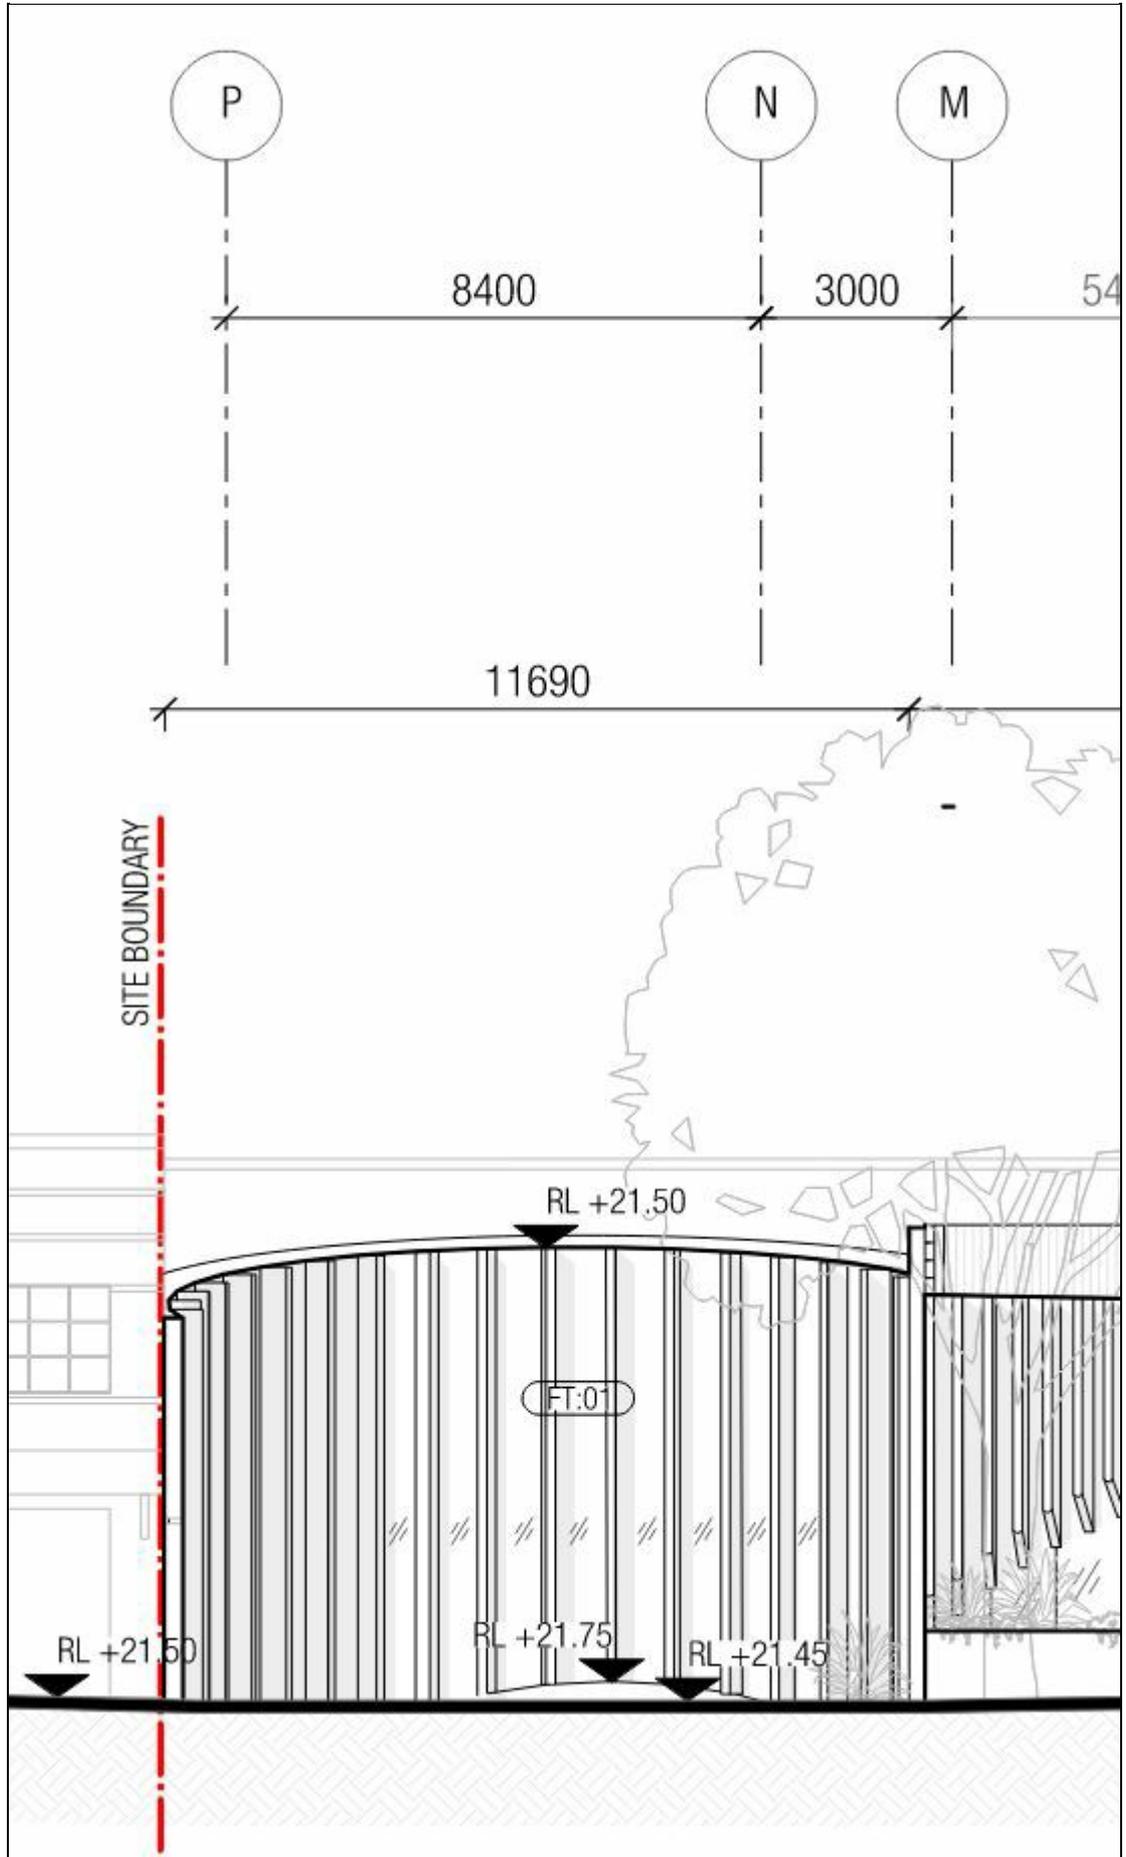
Approved elevation of Brisbane Street access point under PLN-21-869.
